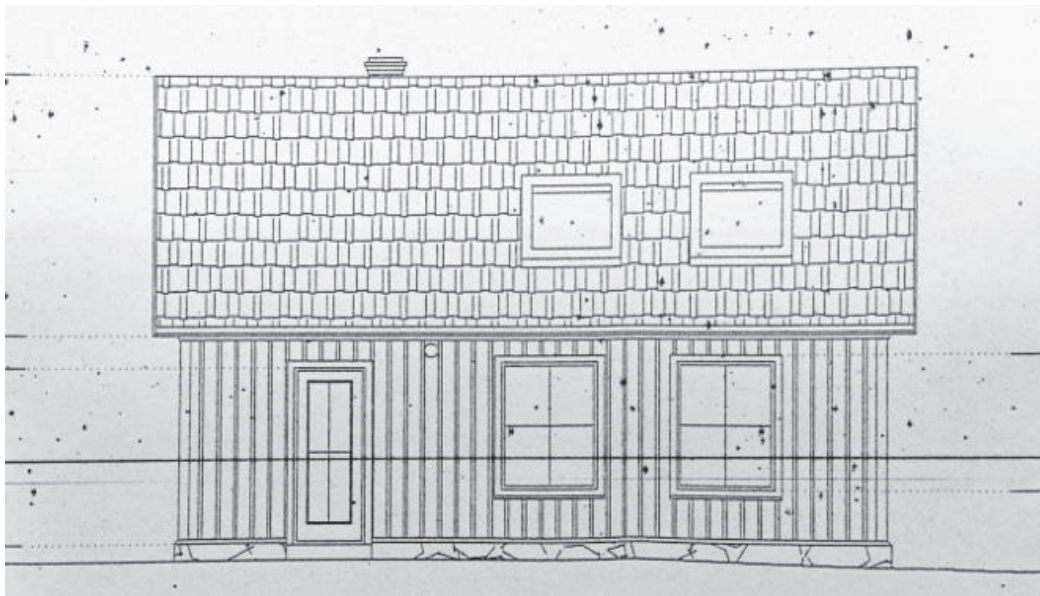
The harmonizing façade of the outbuilding was recreated by using wooden panel boarding, historized composition of windows, natural stone over ground foundations and wooden roofing.
